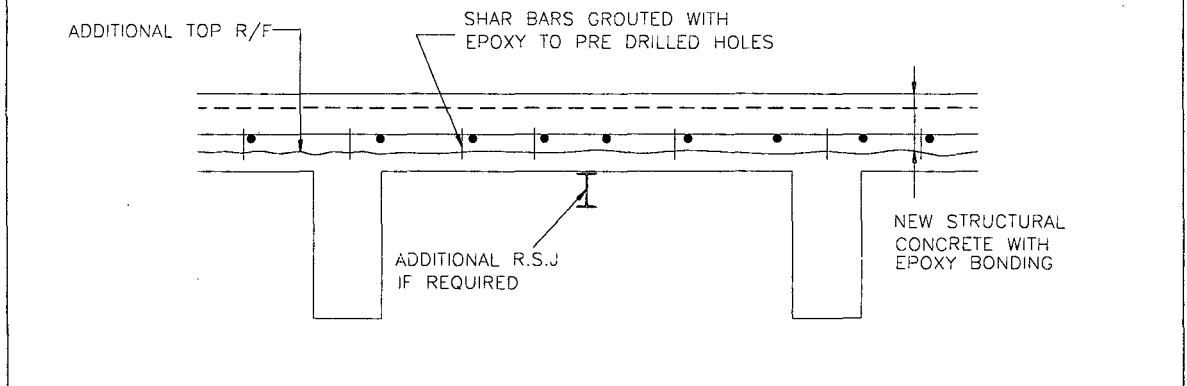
Certain original slab design is marginal and even deficient. Provision of additional steel joist at a suitable location may be mid-span support, is a routine repair technique. Usual connection of flange of joist with slab soffit need be developed with appropriate mortar in fill. The apprehension generally raised for such repairs is about non-availability of R/F in the slab to deal with changed spans. However, some serious thinking invariably reveals that the proposal is good enough due to reduced span and sufficient strength of the concrete of the concrete cross-section alone. The changed behaviour offers immense relief at reduced repair cost. In slabs, the flexural variation is not substantial and extensive so as to be the cause of concern for such simple solutions. In extreme cases appropriate provisions of additional support reinforcement is also possible without undue difficulties.
